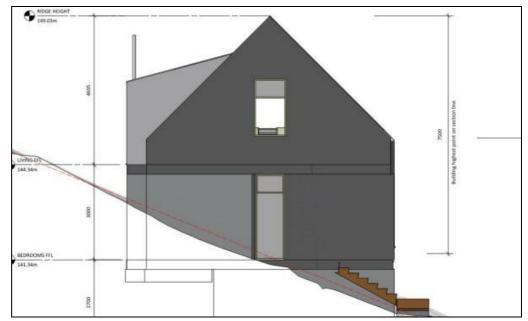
Western (side) elevation of the dwelling at 88 Liverpool Crescent, to the east of the subject site. Source: Documents approved under PLN-12-00316.
